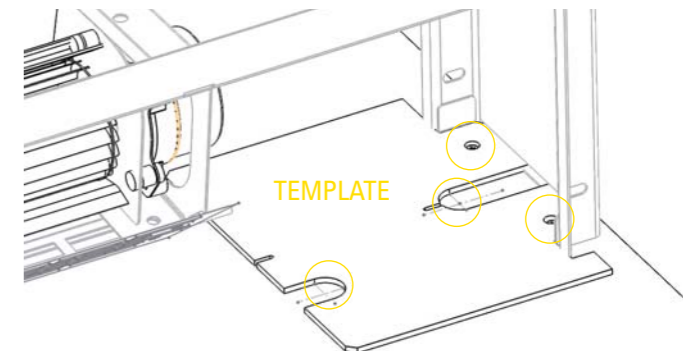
Mark the heating water pipe position, return pipe position, and convector mounting holes on the floor. Connect the supply pipe to the bottom outlet of the heat exchanger. This is where the thermostatic valve is installed. The screw fitting is installed on the outlet - top pipe.
